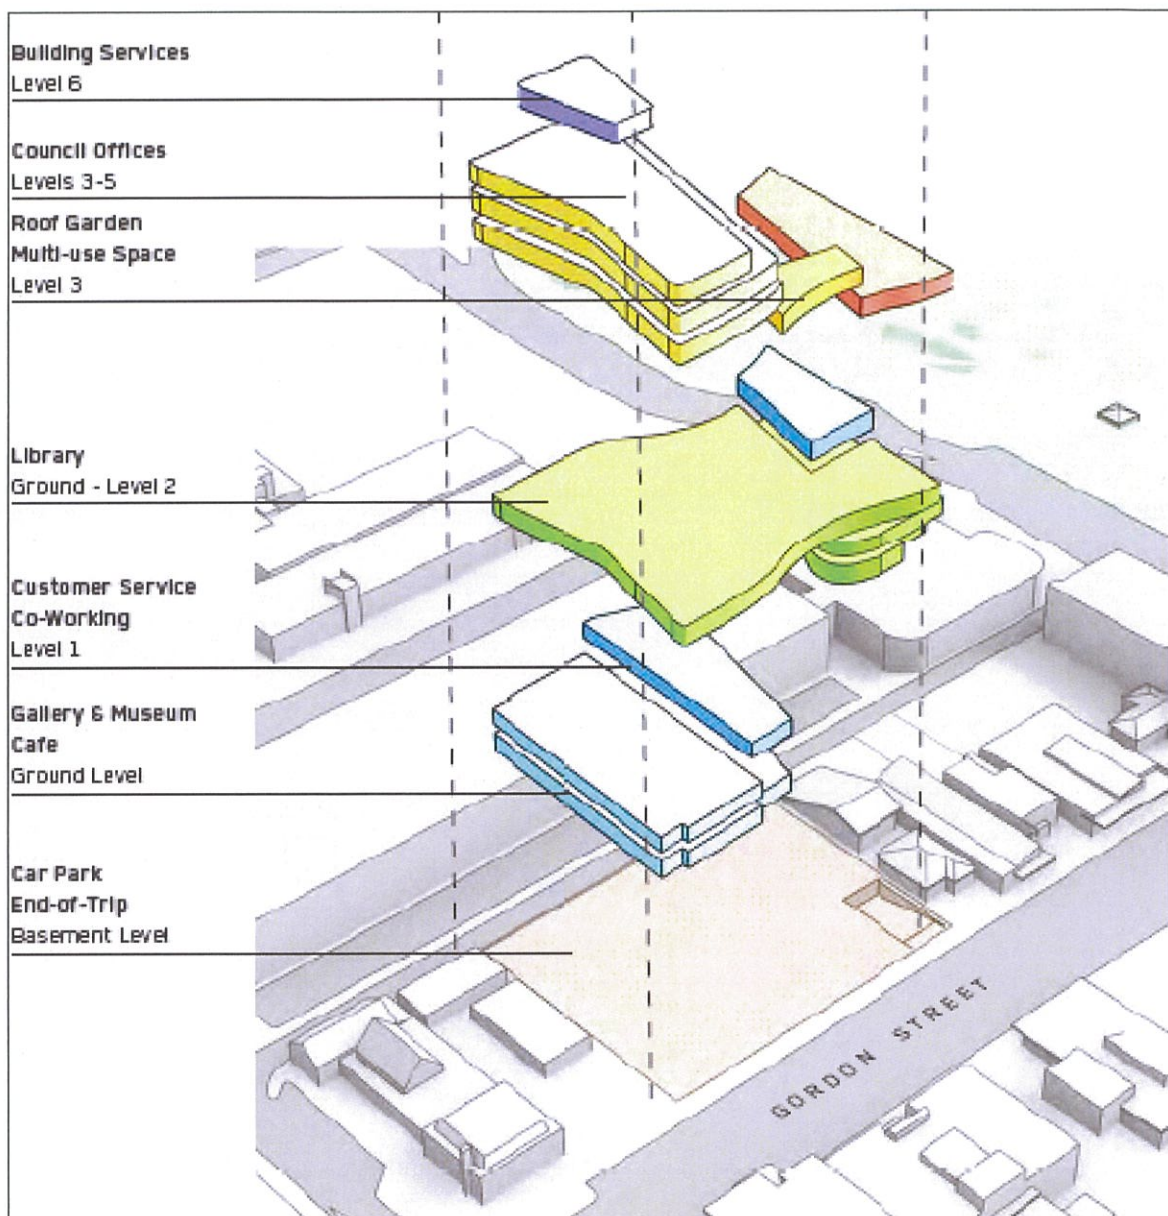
| Site and building organisation and functional arrangement (source: Applicant's Design Report)
